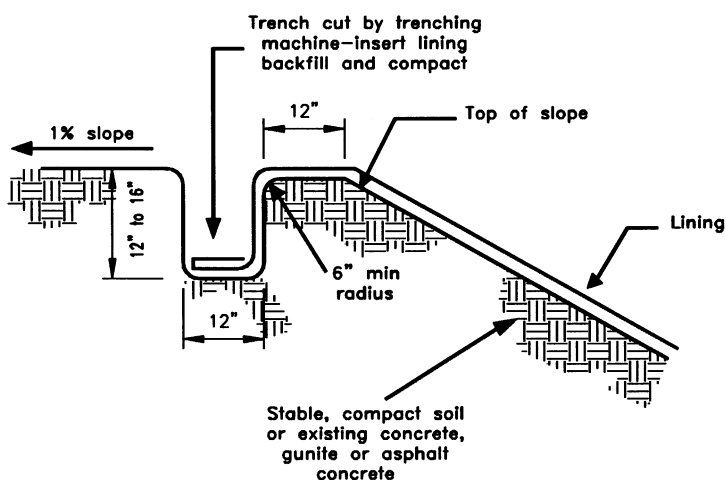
Anchoring of pond lining at top of embankment (EPA, 1983).
